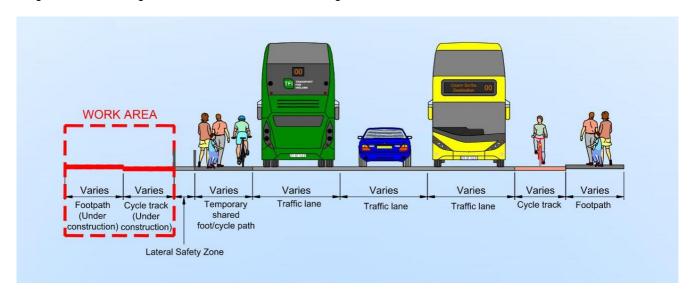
Traffic Management Cross Section, Section 2 - Stage 5
